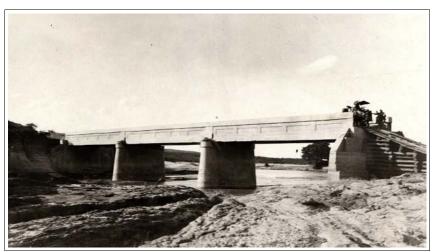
Fairbank Bridge under construction, 1912. ADOT. (Bridge has been demolished.)
